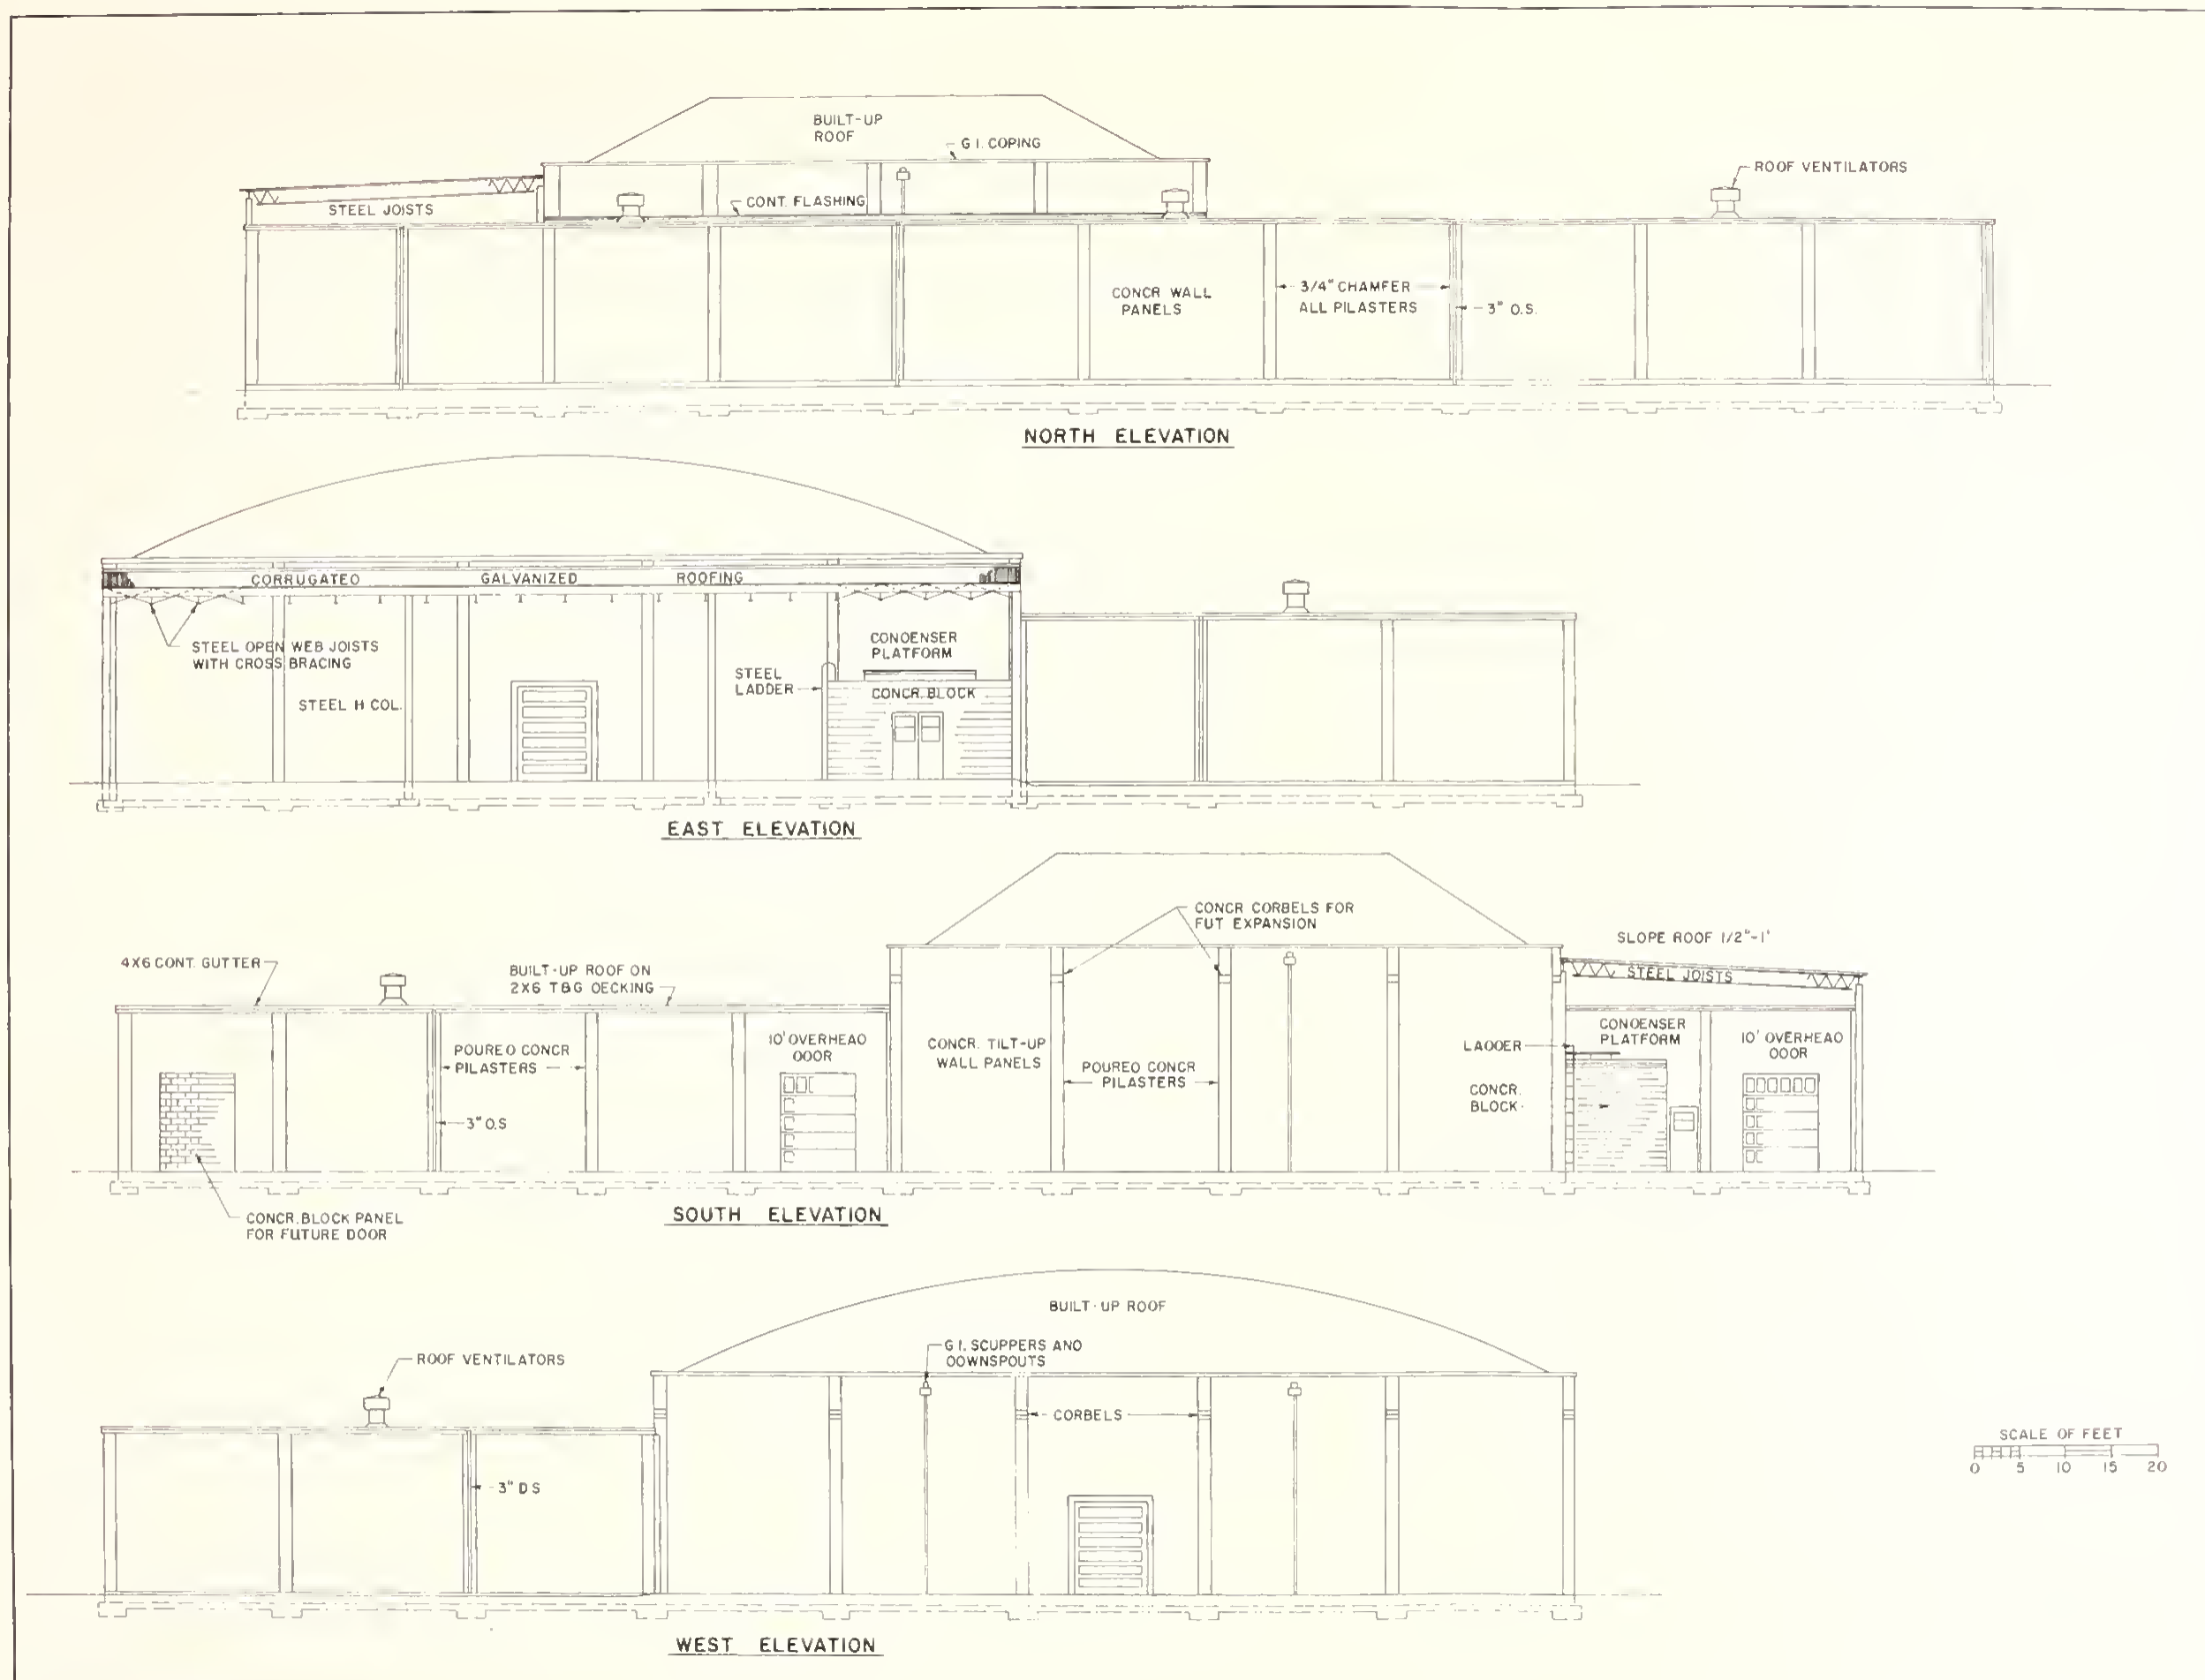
Elevations for the 50,000-box-capacity apple packing and storage house.
